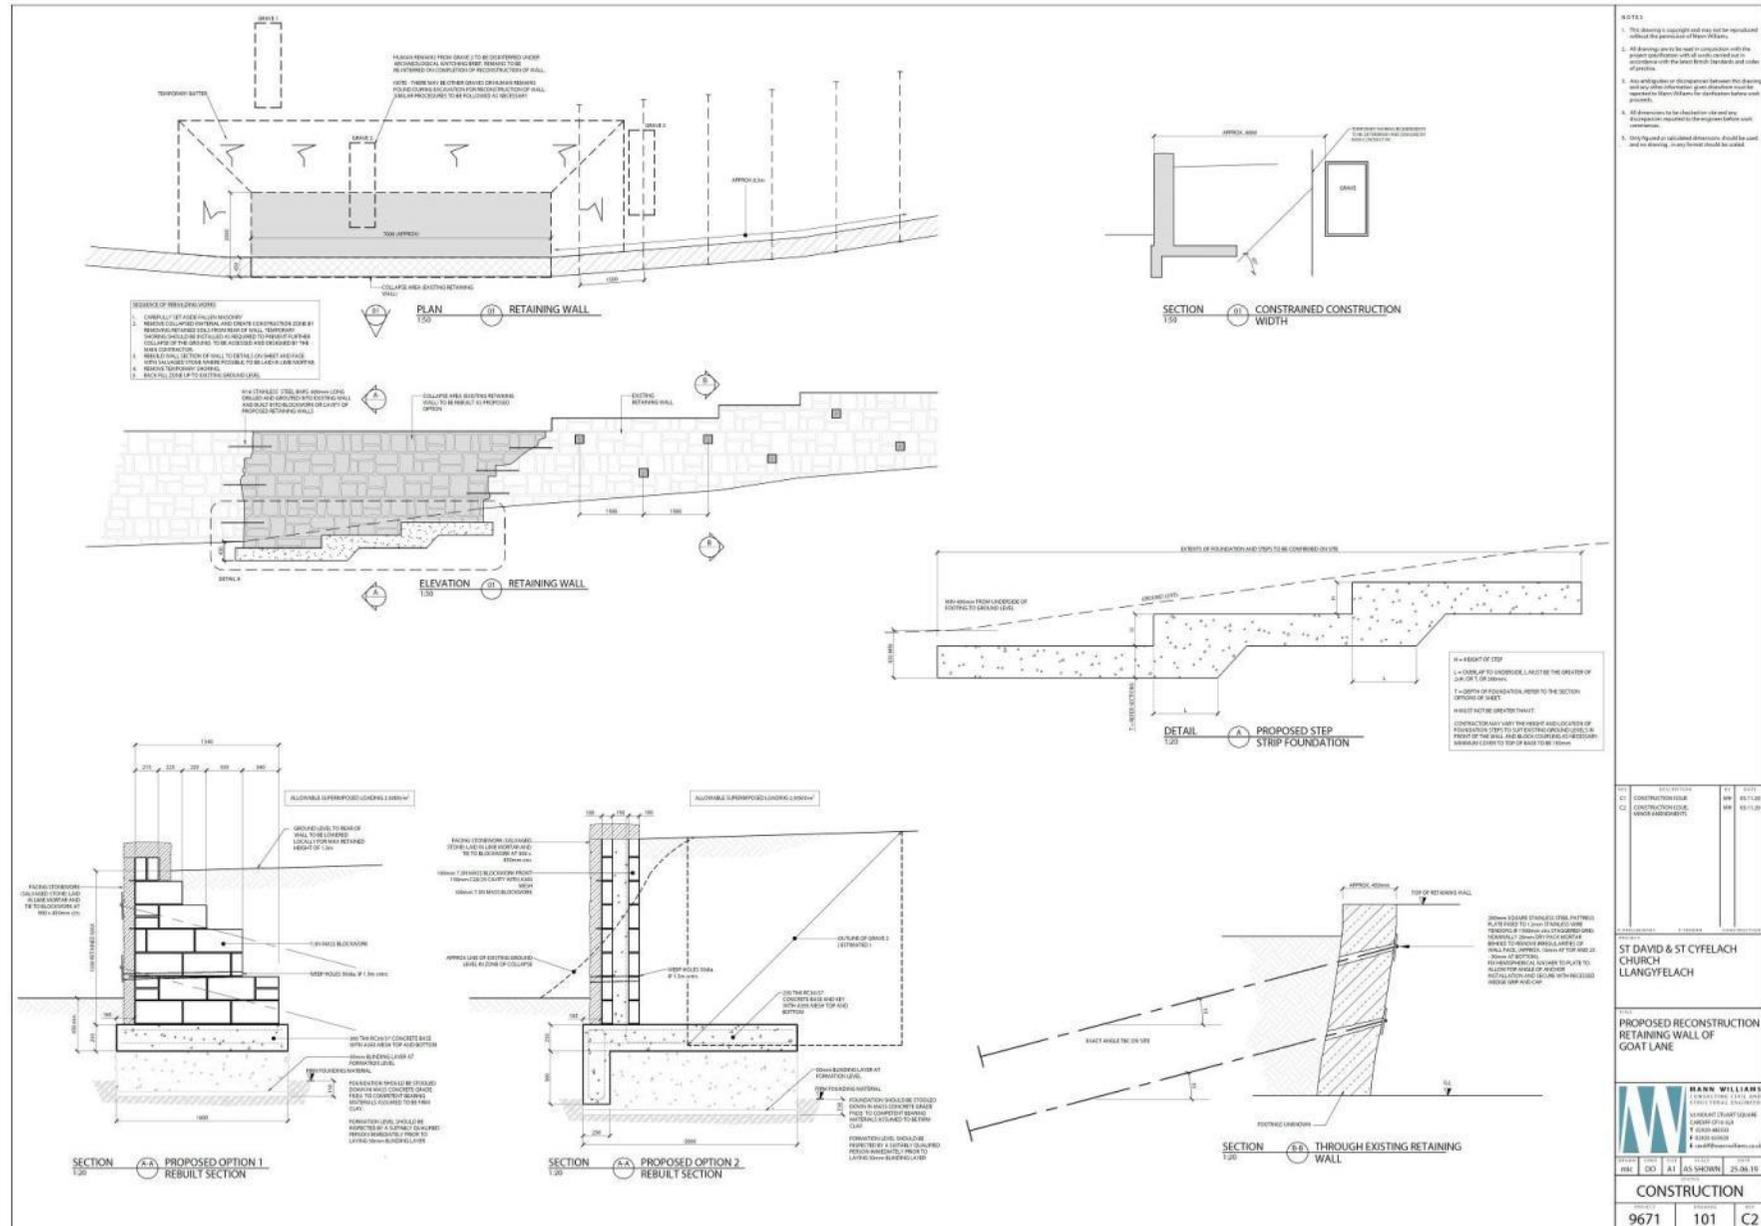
Details of proposed wall reconstruction. Not reproduced to scale.
